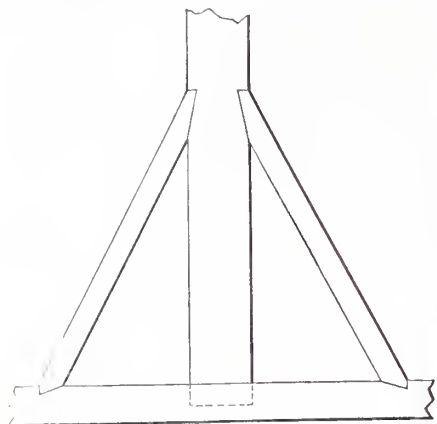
T. H. S.'s Construction in Frame Buildings.
